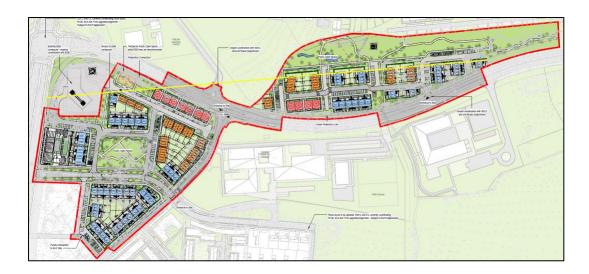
Proposed Site Layout for KSG5 (Source: McCawley Daye O'Connell Architects)
